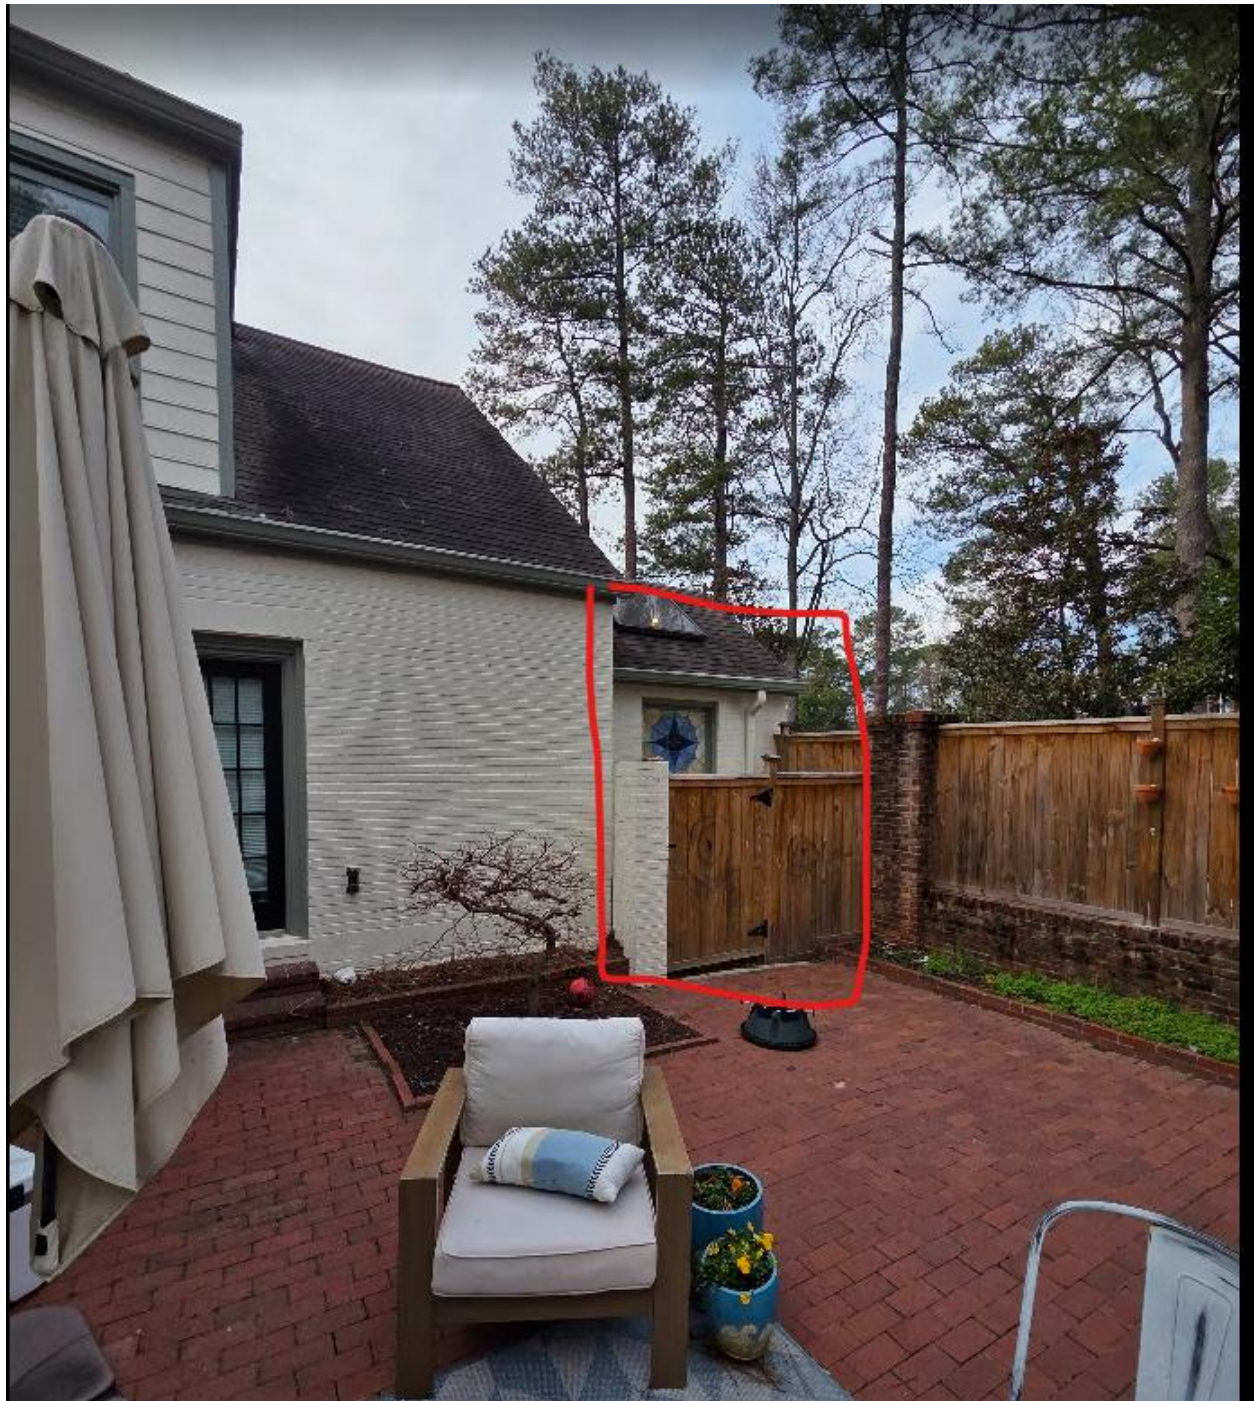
Small extension to provide more square footage and provide room for the door to the new bathroom
